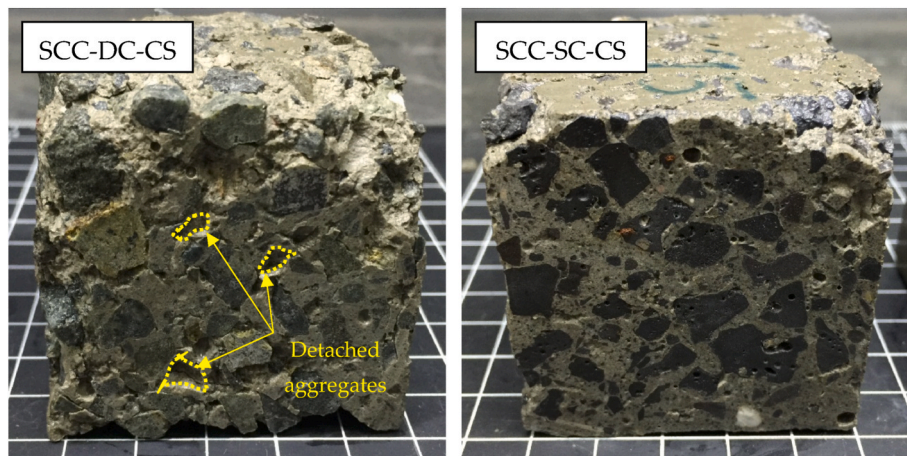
Cupola slag specimen appearance after 7 freezing-thawing cycles.
